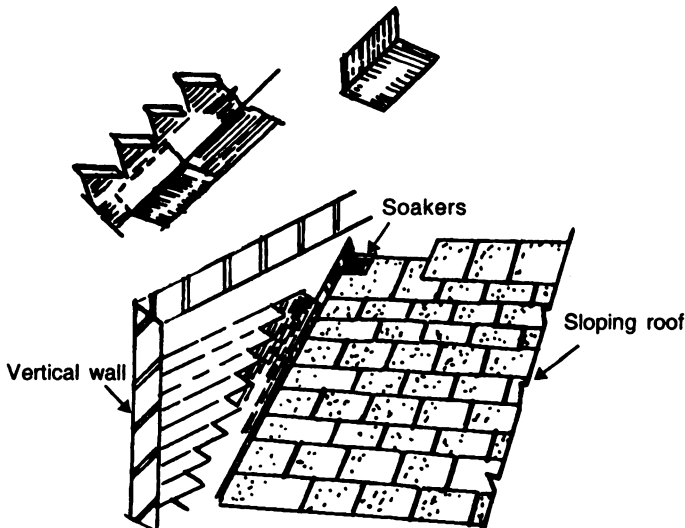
Flashing between sloping roof and vertical wall-stepped flashing wedged and painted in brick joints.
